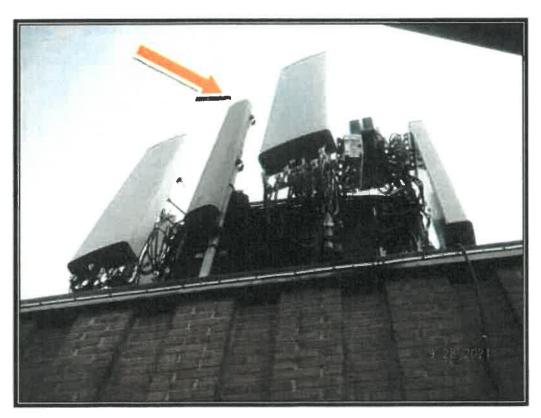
Proposed Location of B2 mmWAVE Integrated Antenna/Radio on New Mast Pipe
